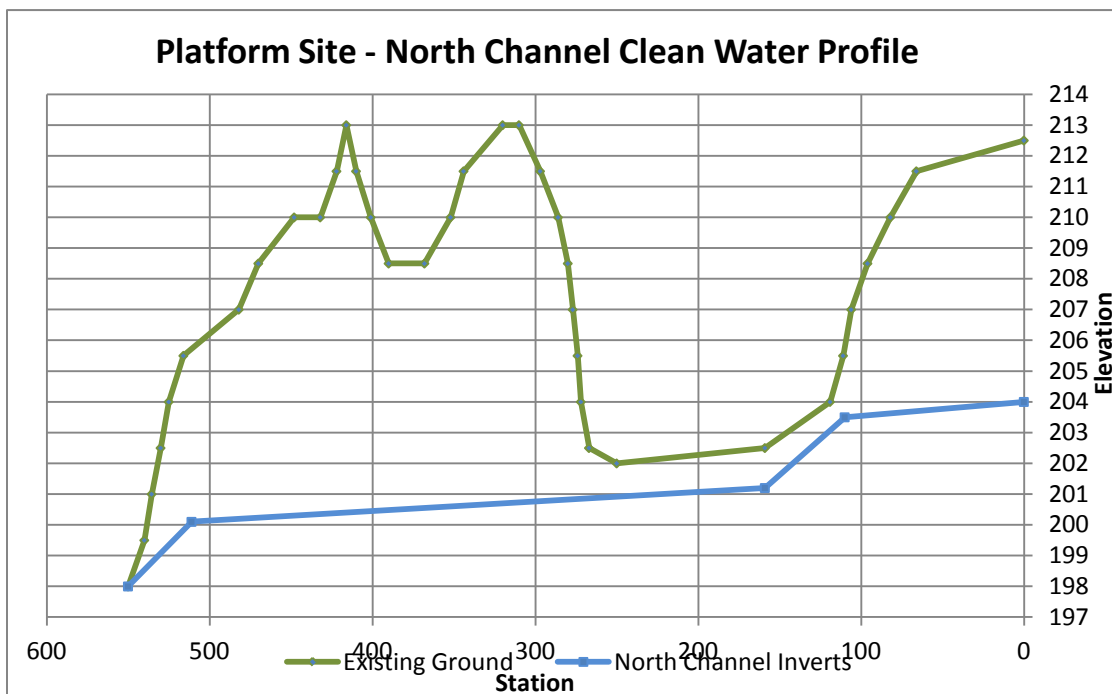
North Diversion Ditch (Ore Stockpile Platform)
